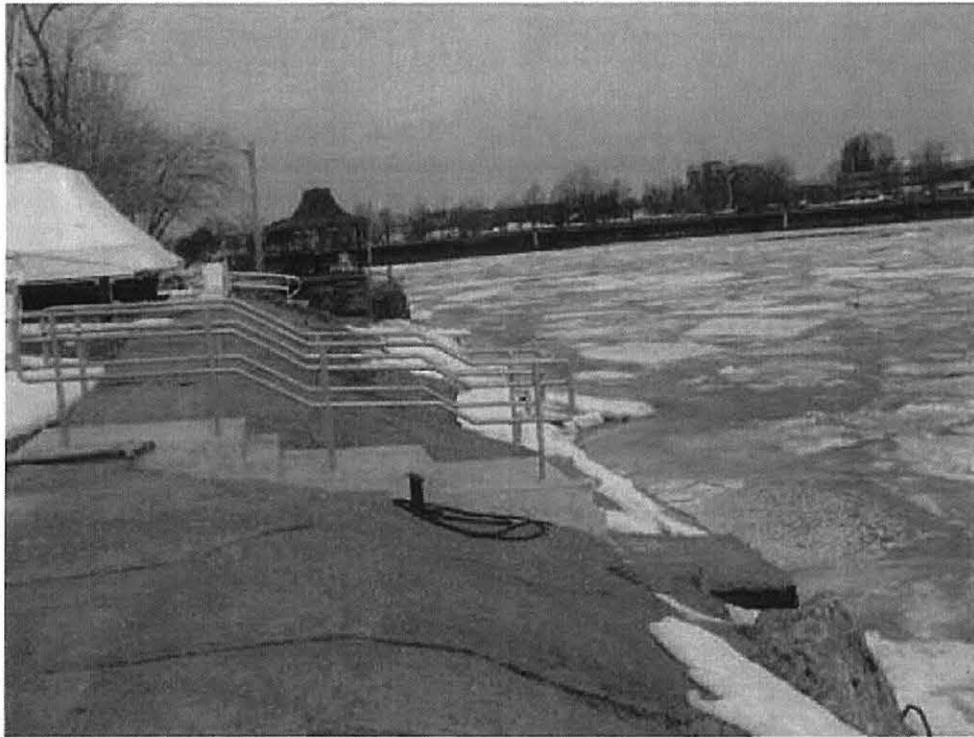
Shoreline Looking North Toward Pavilion Structure in Winter Mooring Area
